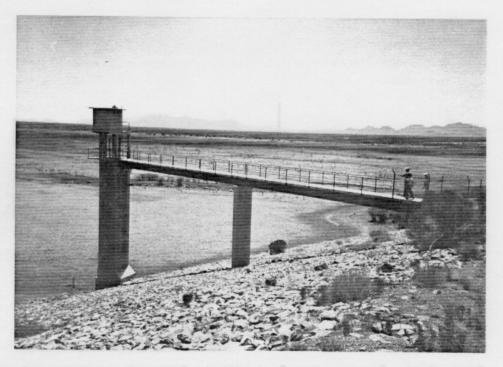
Conservation Outlet Works Intake Tower and Access Bridge (looking southwest from the main dam embankment).
